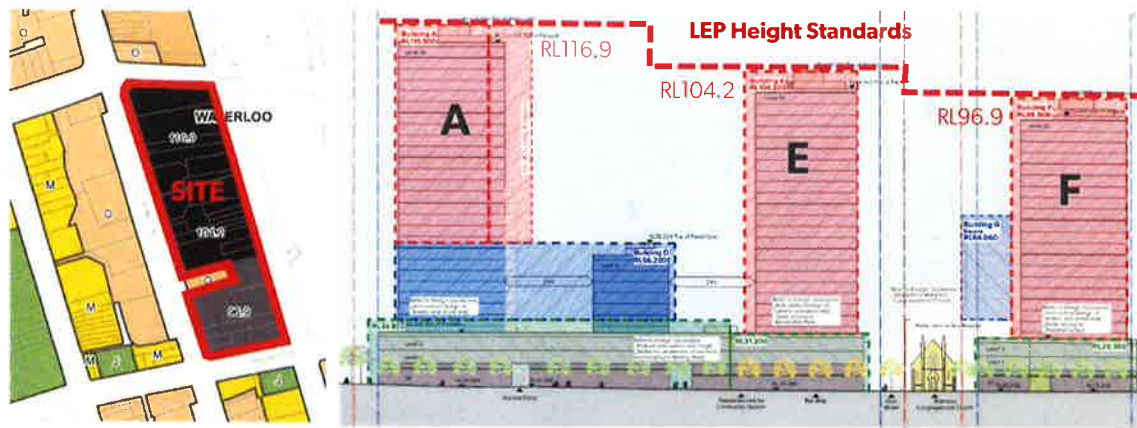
| Extract from Sydney LEP Maximum Building Height Map (left) and elevation of proposed envelopes (right)
